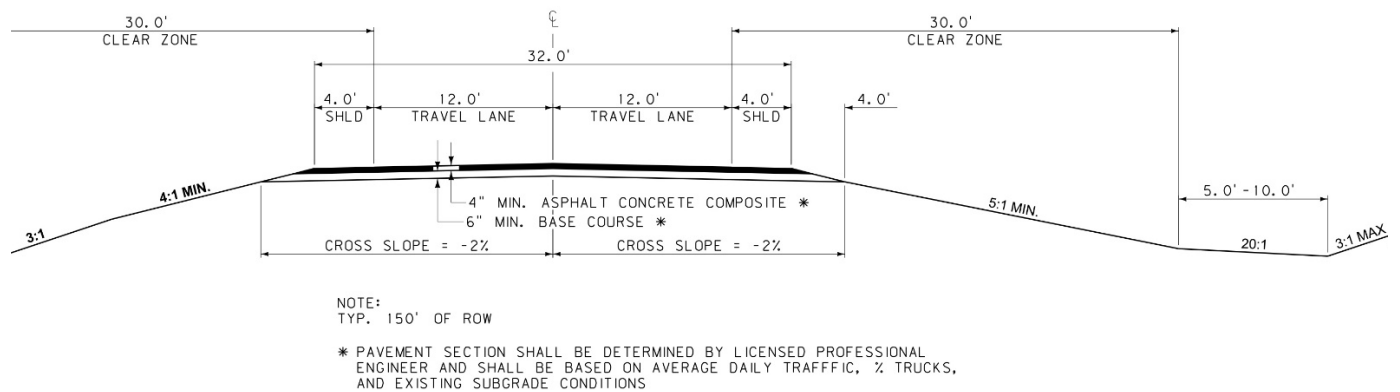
Standard High-Speed Gravel Road Typical Section
